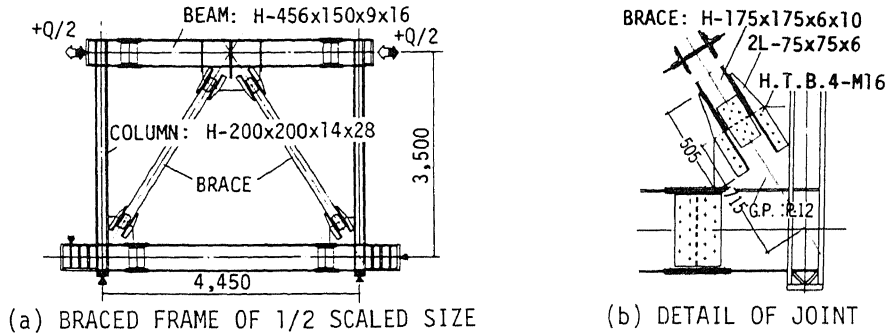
LOADING TEST OF K-SHAPED BRACED FRAME
